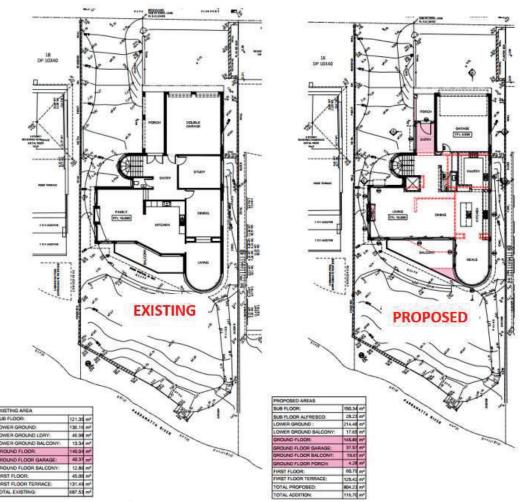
Proposed floor plan changes to ground floor level. Source: Architectural Plans prepared by Construction by Design
